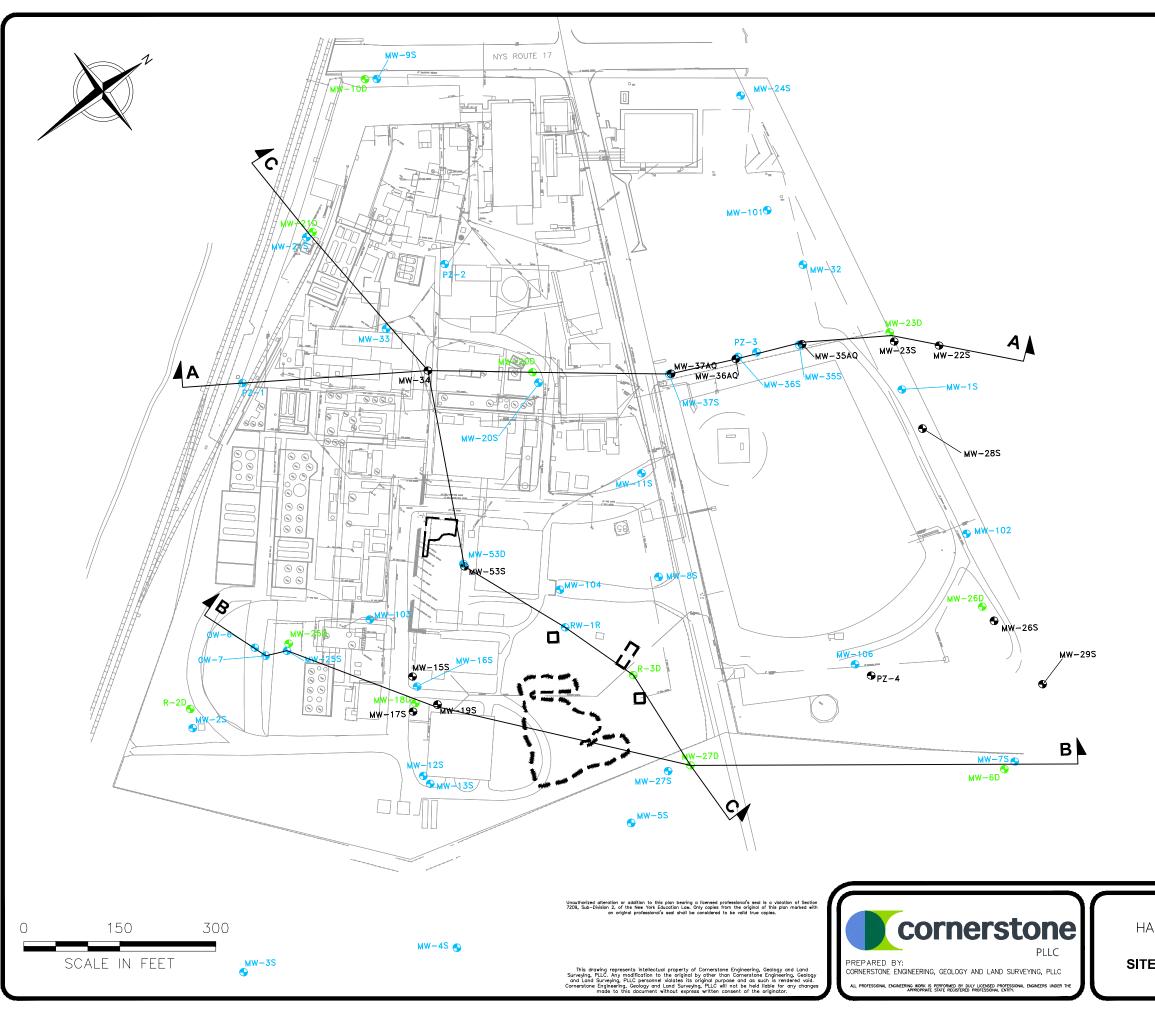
SITE PLAN FORMER NEPERA PLANT SITE, HARRIMAN, NEW YORK
